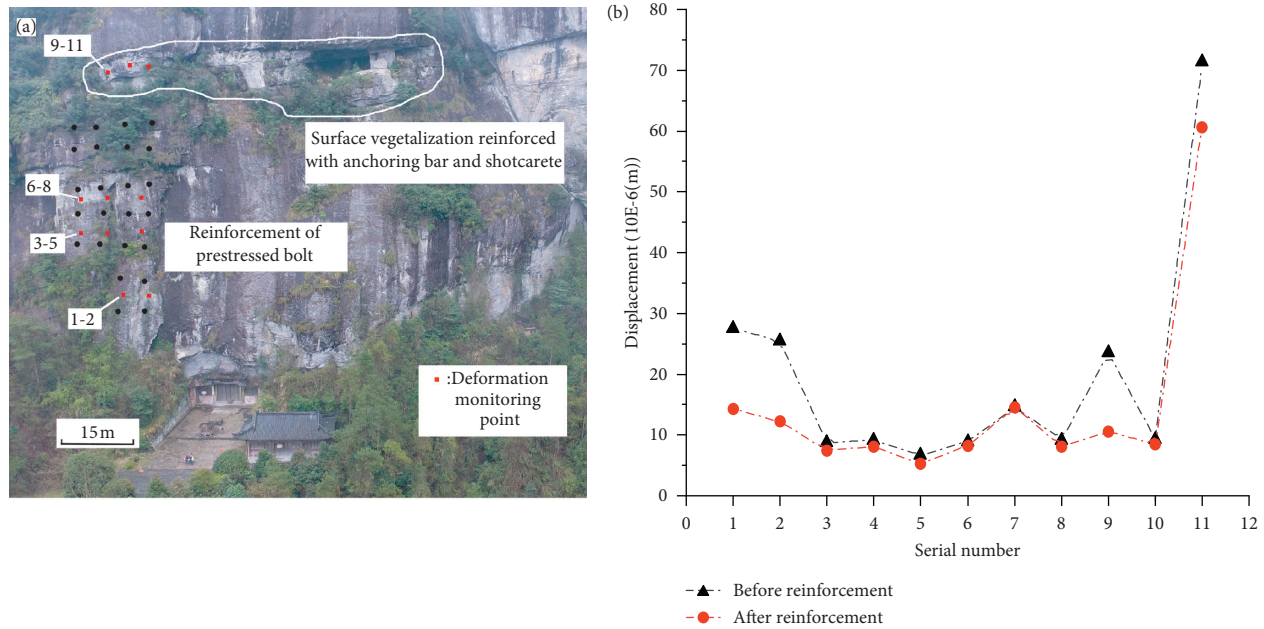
Engineering reinforcement measures. (a) Engineering reinforcement plan; (b) deformation monitoring results.
